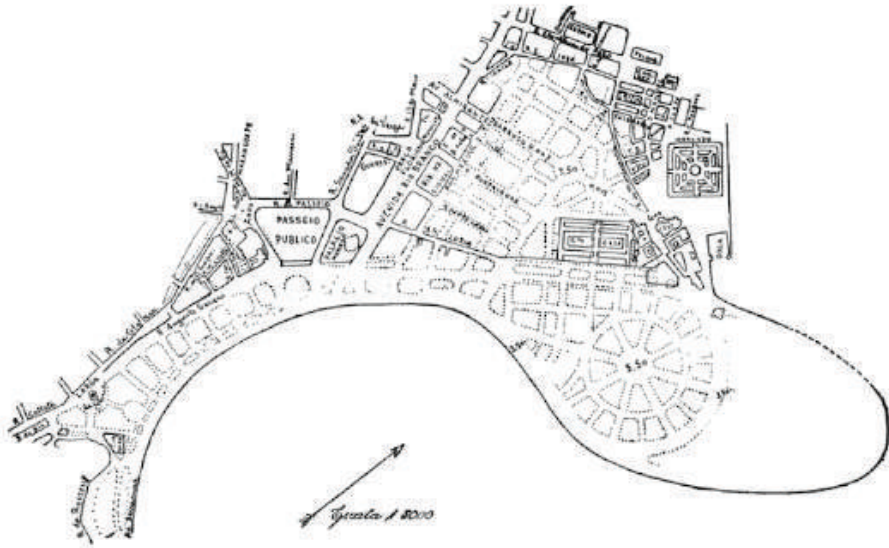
Project of construction and pavement of streets for the area that was formed from the excavation of Castelo hill and for the land filled area from Glória up to Ponta do Calabouço, according to the proposal of a committee of engineers and architects appointed by the mayor of Rio de Janeiro, Carlos Sampaio, 1920–1922
